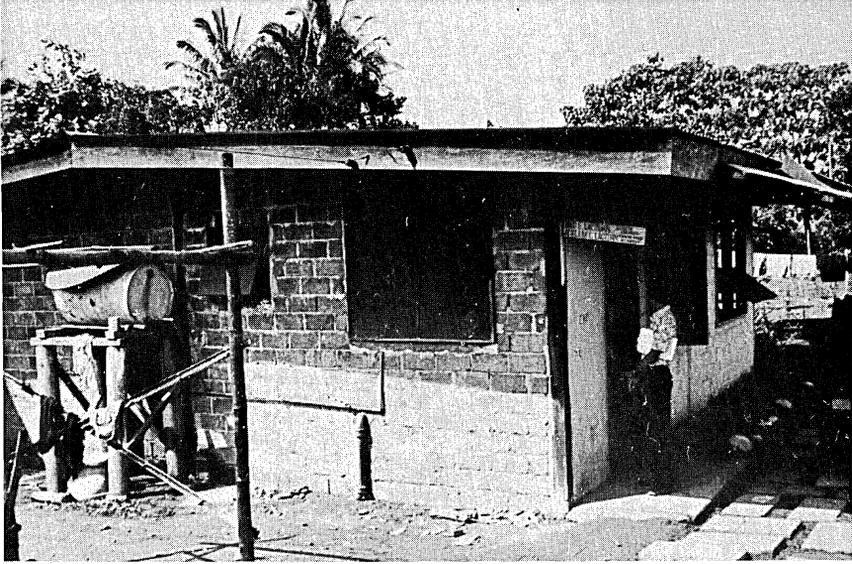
This house utilizing soil-cement building block materials for both exterior walls and floor tile has been constructed at Mindanao State University, Philippines. The floor area is 45 m² and total cost of construction in late 1969 was somewhat lower than US \$600, excluding land. The galvanized iron sheeting roof is sub-functional and research is continuing to develop more functional and lower cost roofing system.
